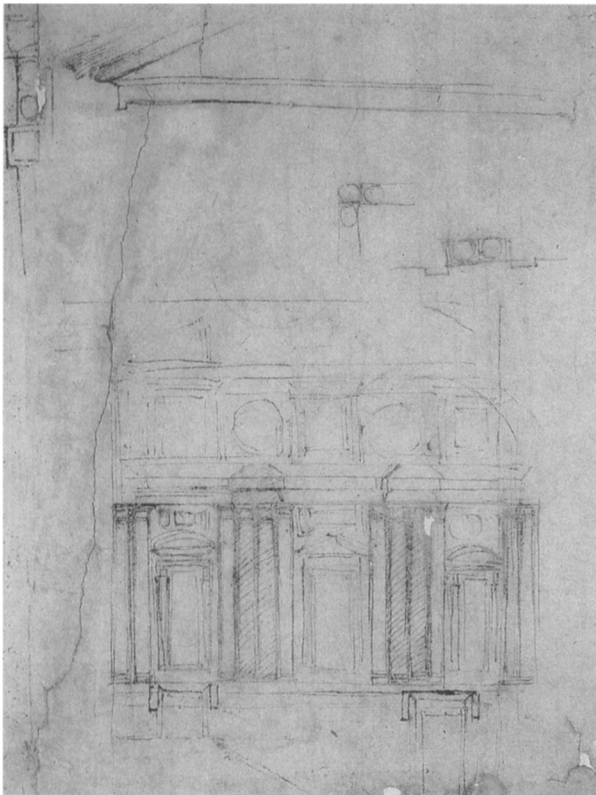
Michelangelo, Casa Buonarroti 48A recto, elevation and detail studies for the west wall of the Laurentian Library ricetto (Casa Buonarroti)
